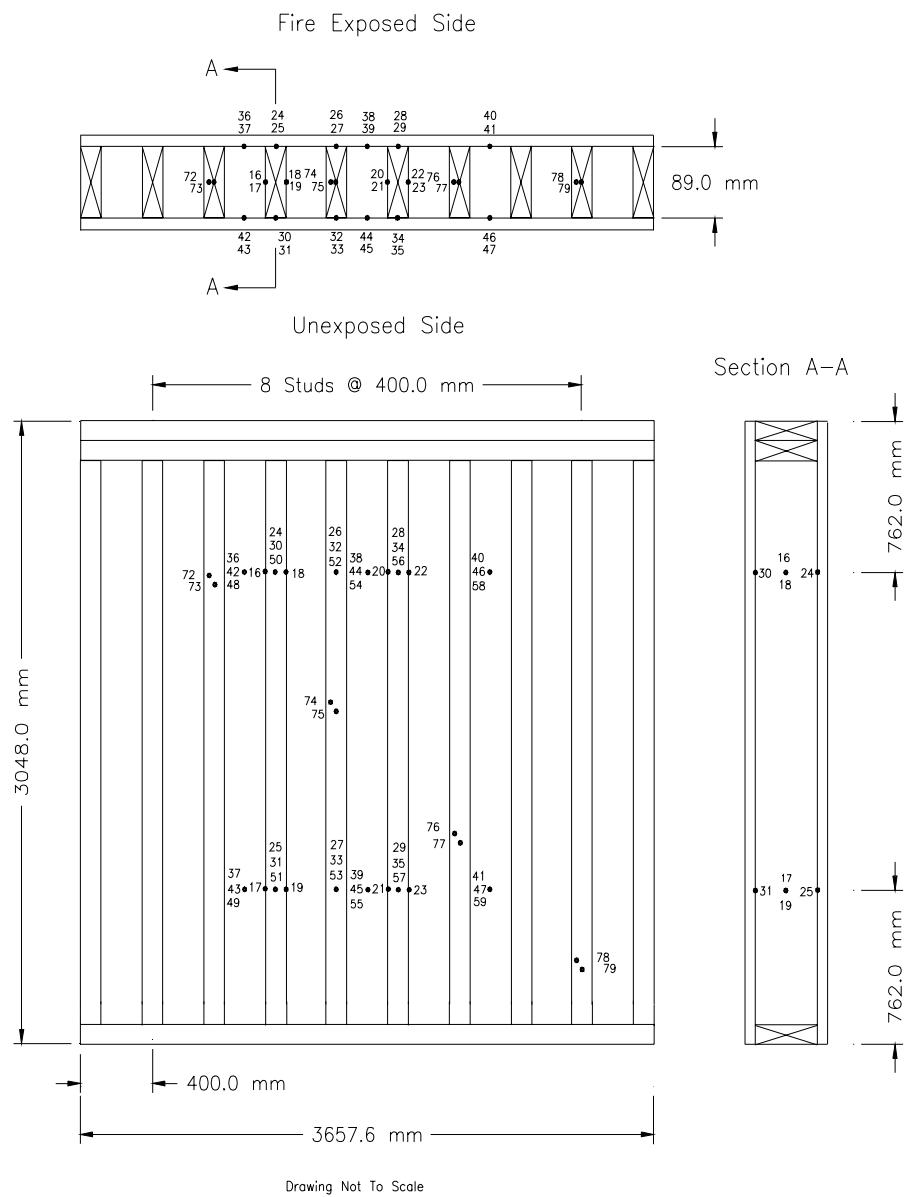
Thermocouple Locations in Wood Wall Assemblies
